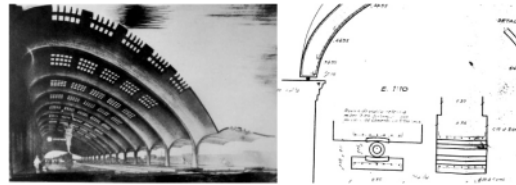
Image of the proposal for Orense railway station roof (left). (Archivo Eduardo Torroja, CEHOPU, reproduced in Arredondo 1978). Support of the roof on the wall of the existing building's façade that allows horizontal displacement. (right). (Archivo Eduardo Torroja, CEHOPU).
